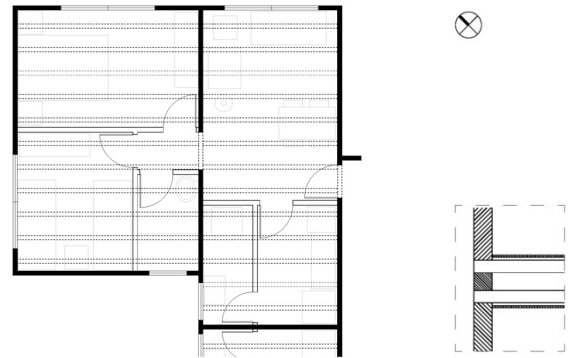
apartment plan with Solid Wall System (4) (section detail of wall-slab connection) – no scale drawing
